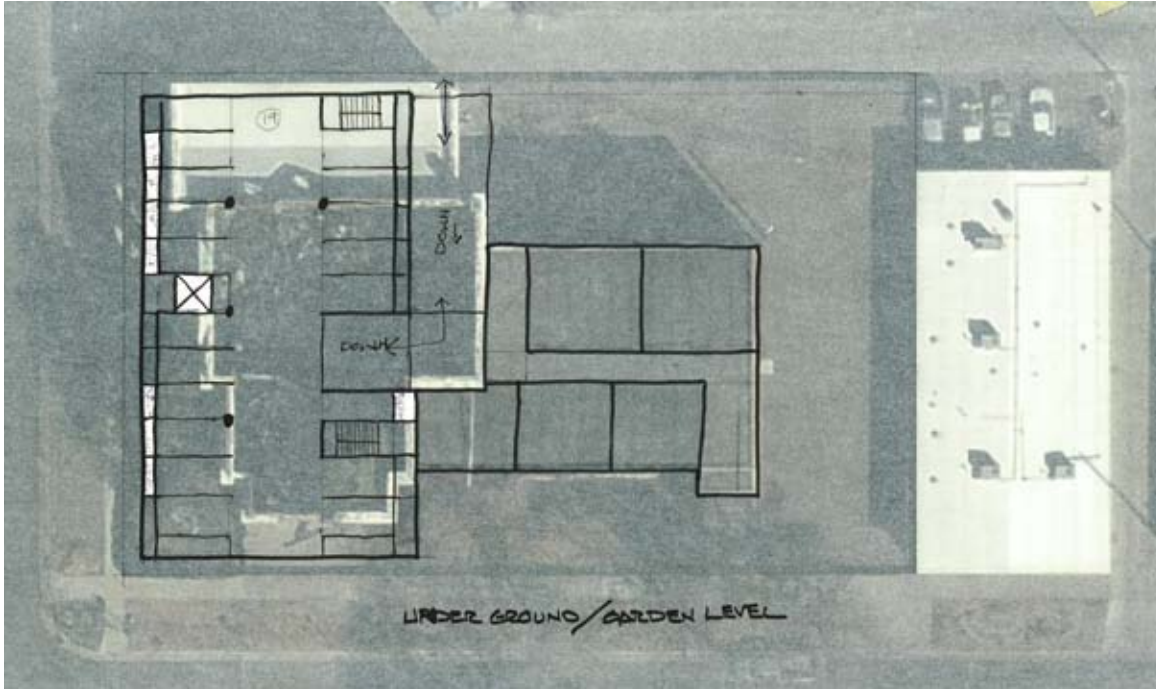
Floor plan showing the proposed layout of the basement of White Hall.
